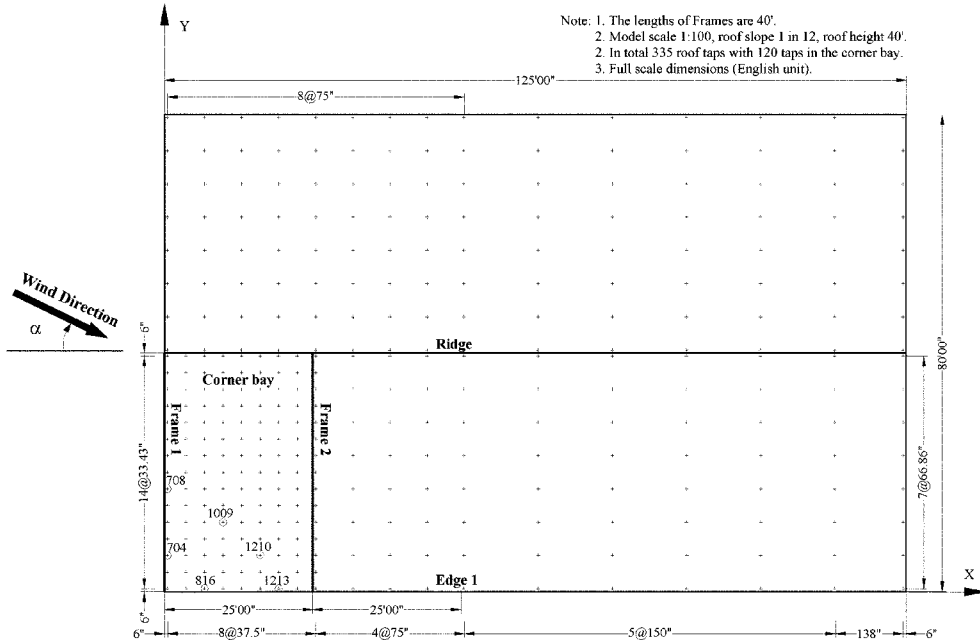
Roof surface of the low building model (full-scale dimensions)
